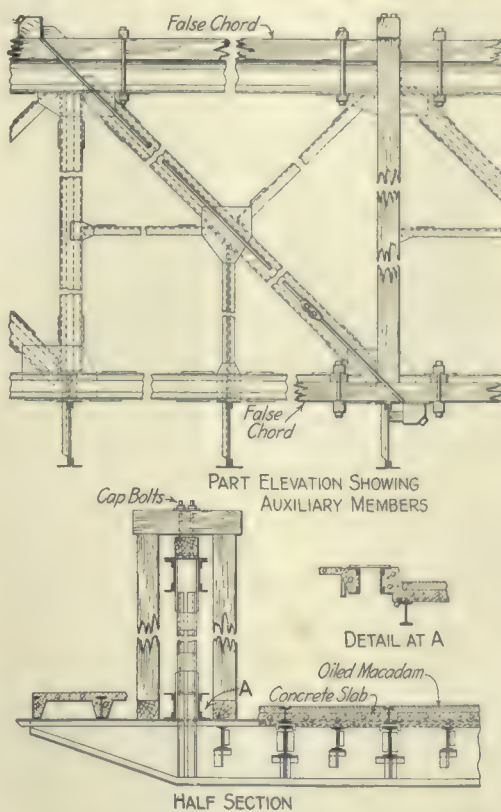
PETTIT TRUSS, WITH DETAILS OF AUXILIARY MEMBERS
